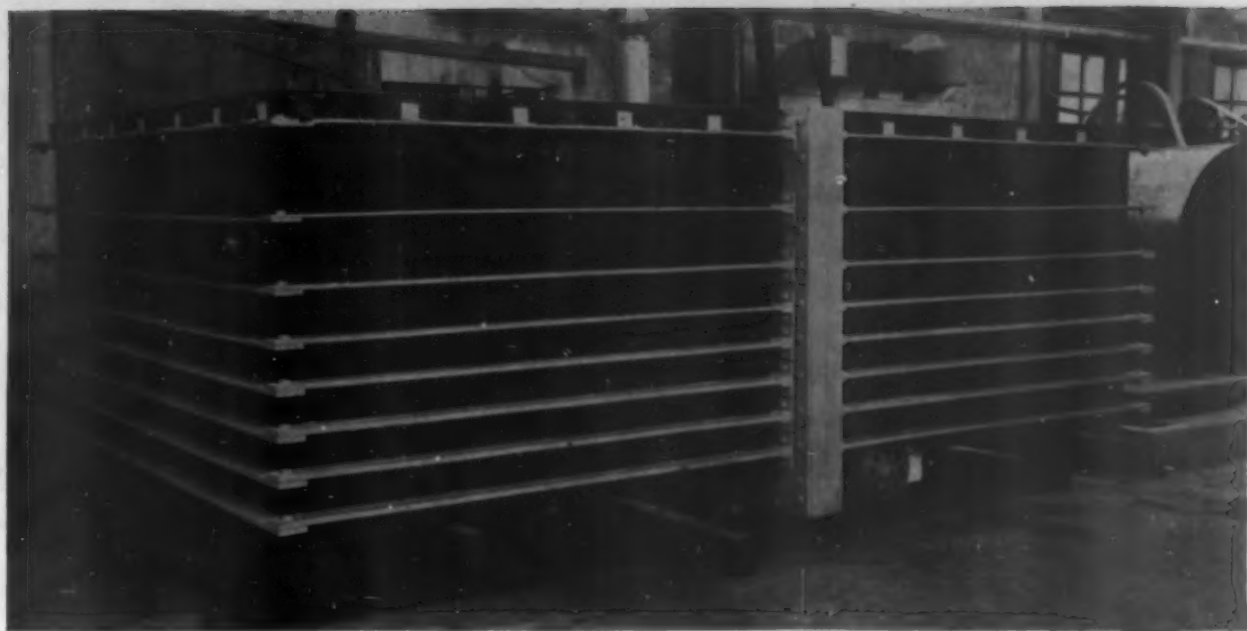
Rectangular tank, 15 ft. by 10 ft. by 5 ft. deep, molded in two pieces, which were bolted securely together afterward
